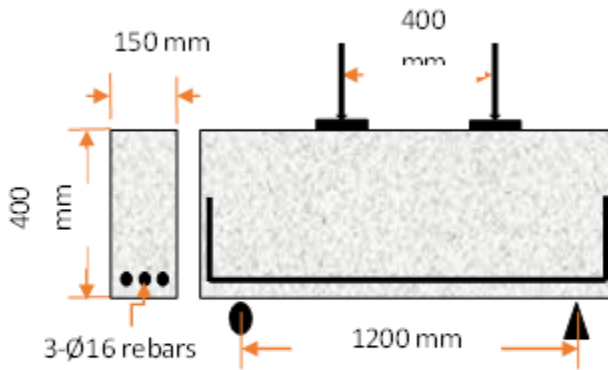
Typical beam's dimensions, reinforcement and test set-up (specimen CBS)
